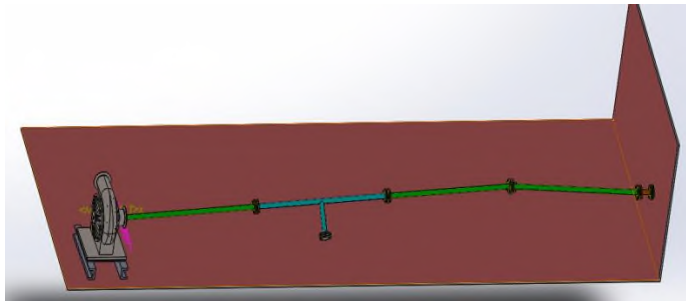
The installation was carried out successfully due to the turns of straight pipes.
